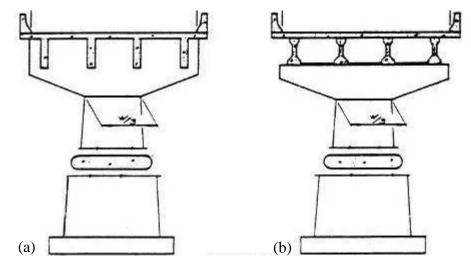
Single Column hammerhead Pier (a) monolithic with superstructure, (b) non-monolithic with superstructure
